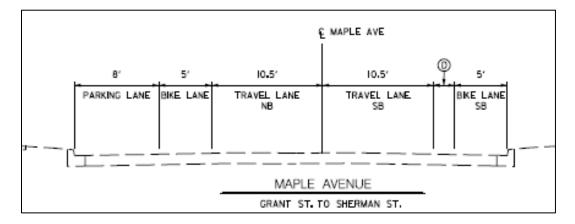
Typical Section - Grant Avenue to Sherman Avenue
